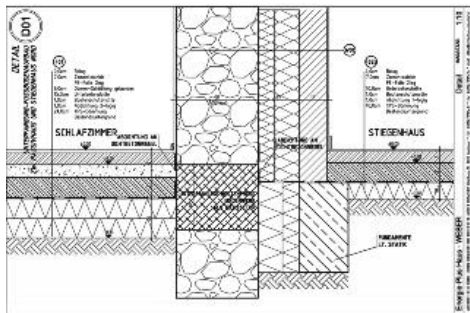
Detail: Underpinning, north side of stone wall (external insulation).
